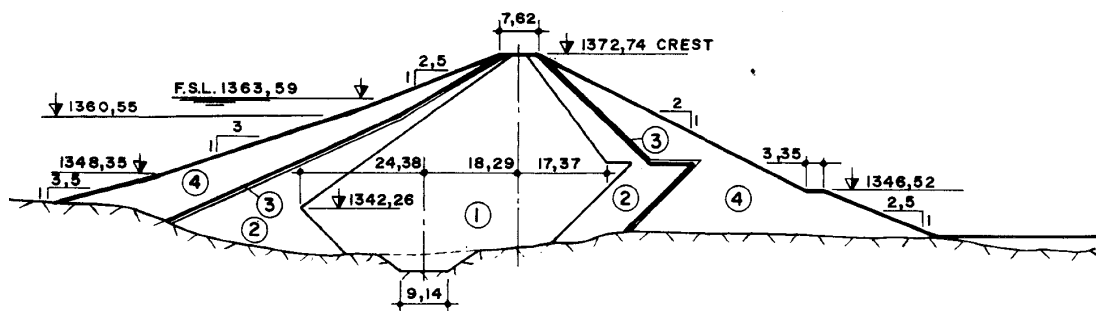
Cross Section of Manyame Poort Dam (Chivero Dam)
